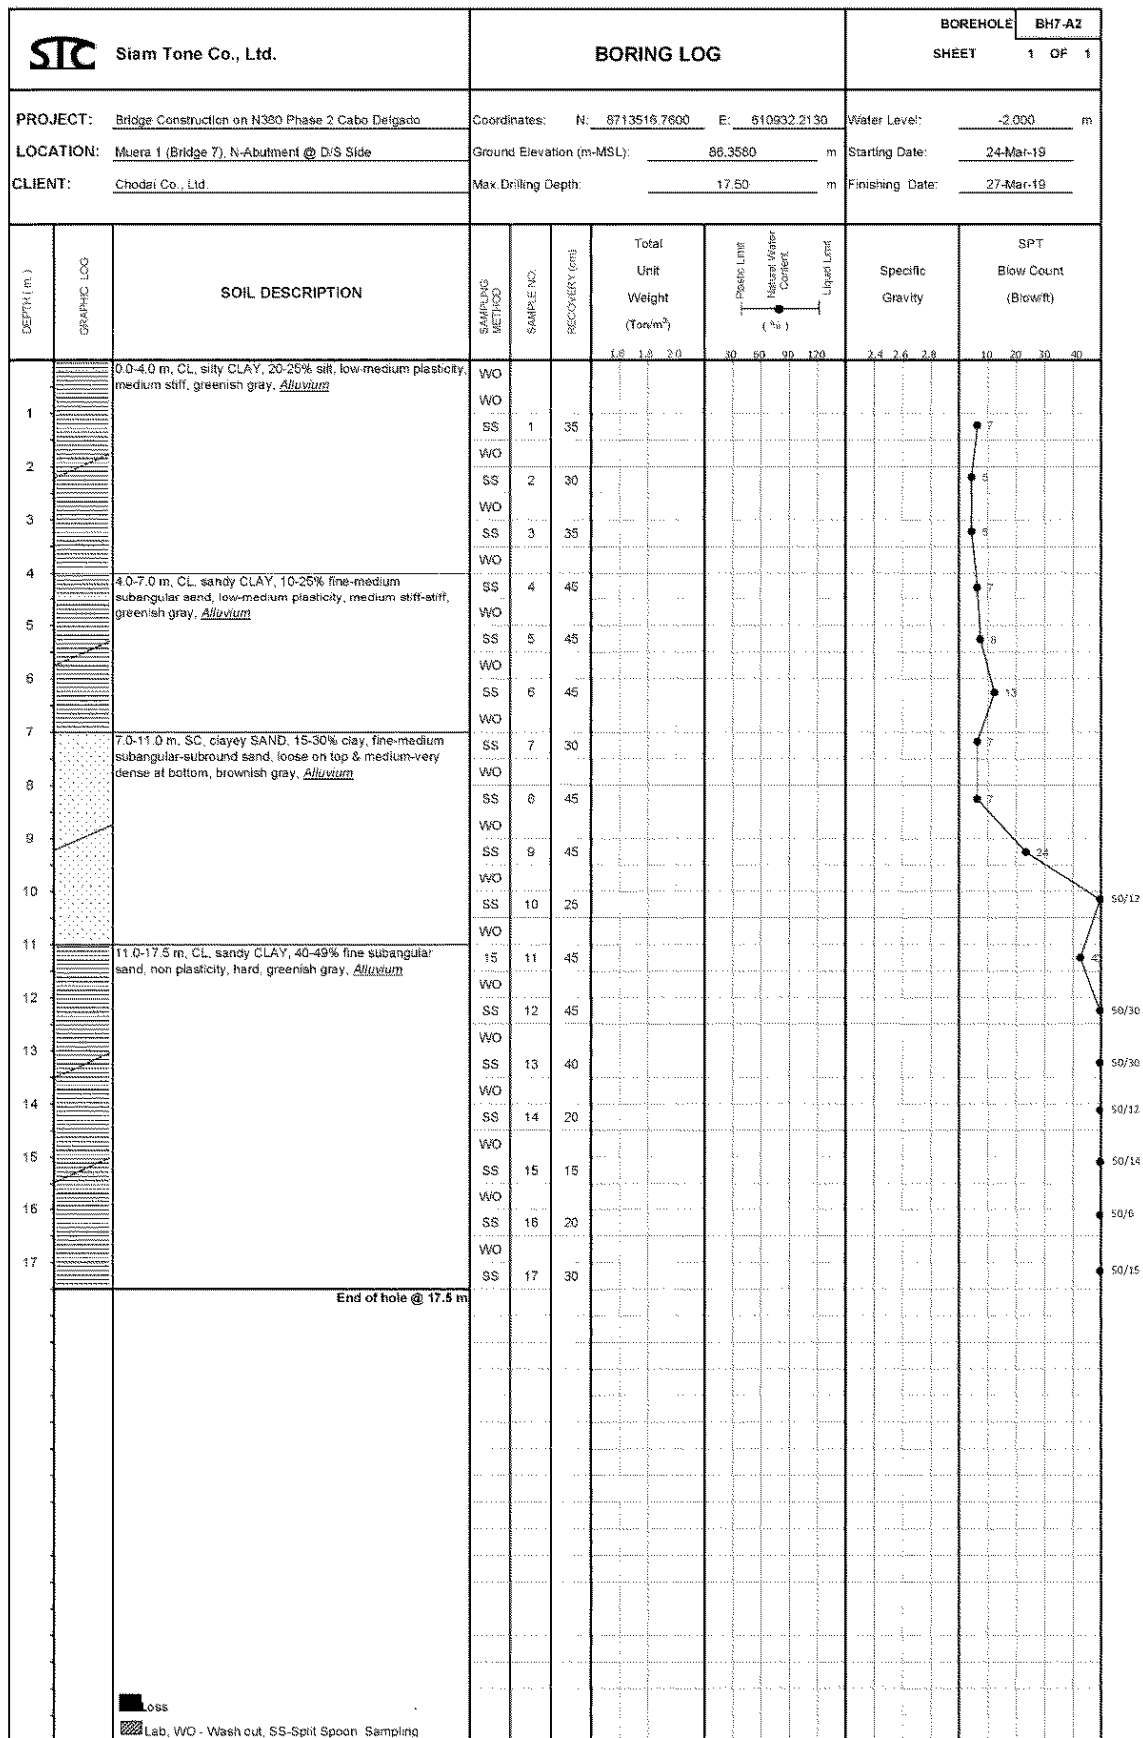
BH7-A2/1 at N-Abutment D/S Side of Muera II Bridge (B7)
